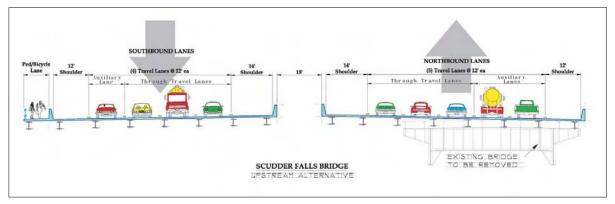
Proposed Scudder Falls Bridge replacement cross-section
